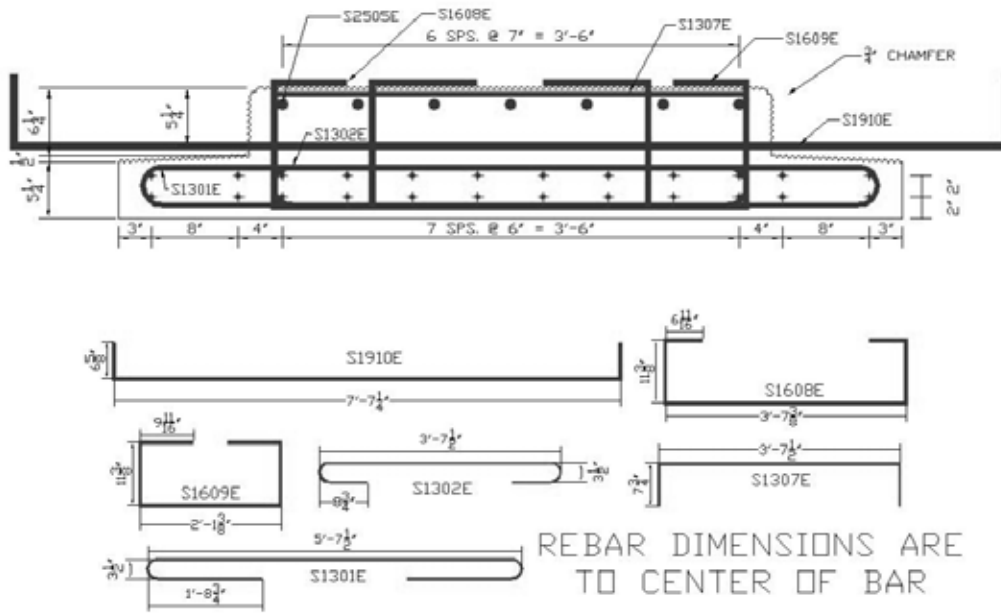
Final, nominal cross section for Center City Bridge precast sections
